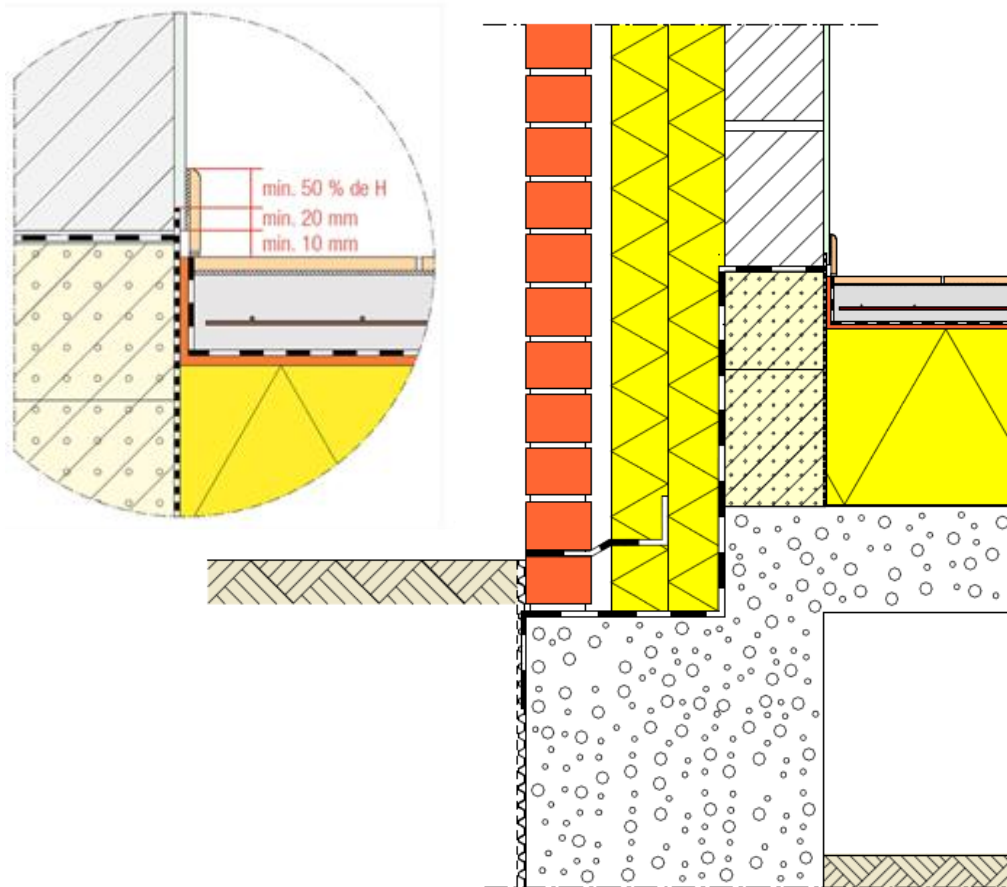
Illustration of a technical detail: junction between façade and floor using airtight membrane
